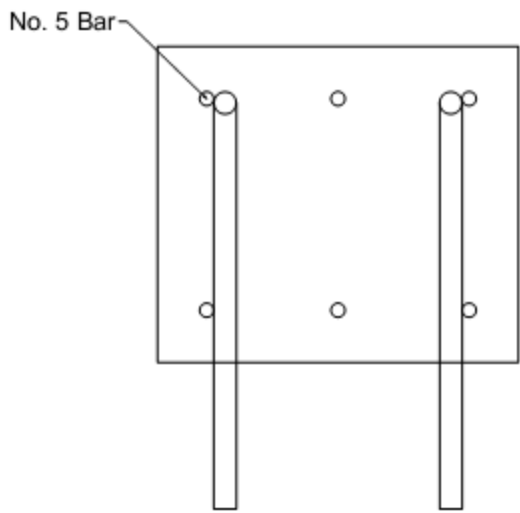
Longitudinal column reinforcement-6 No. 5 bars. Transverse reinforcement not shown.
